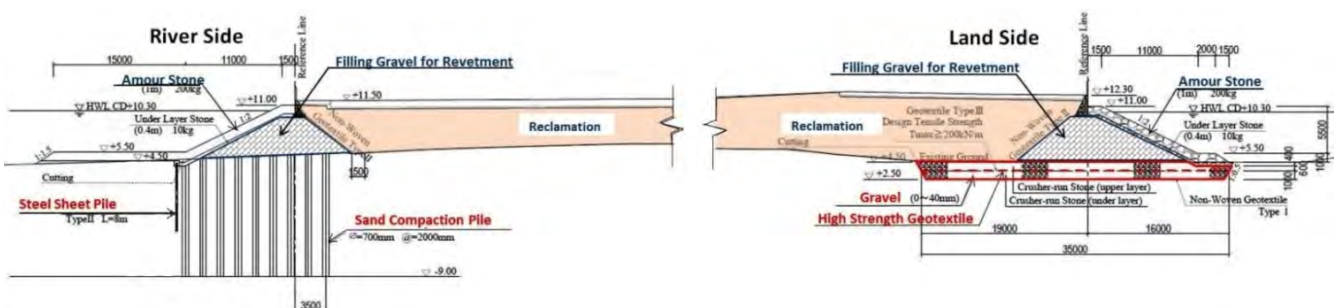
Revetment and Reclamation Works (Section A-A)
